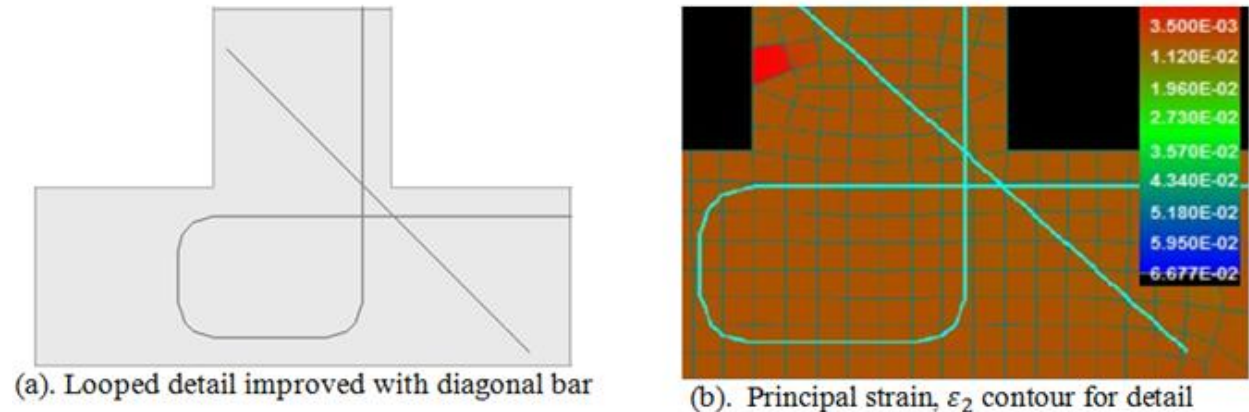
Looped reinforcement detail + diagonal bar at re-entrant corner
